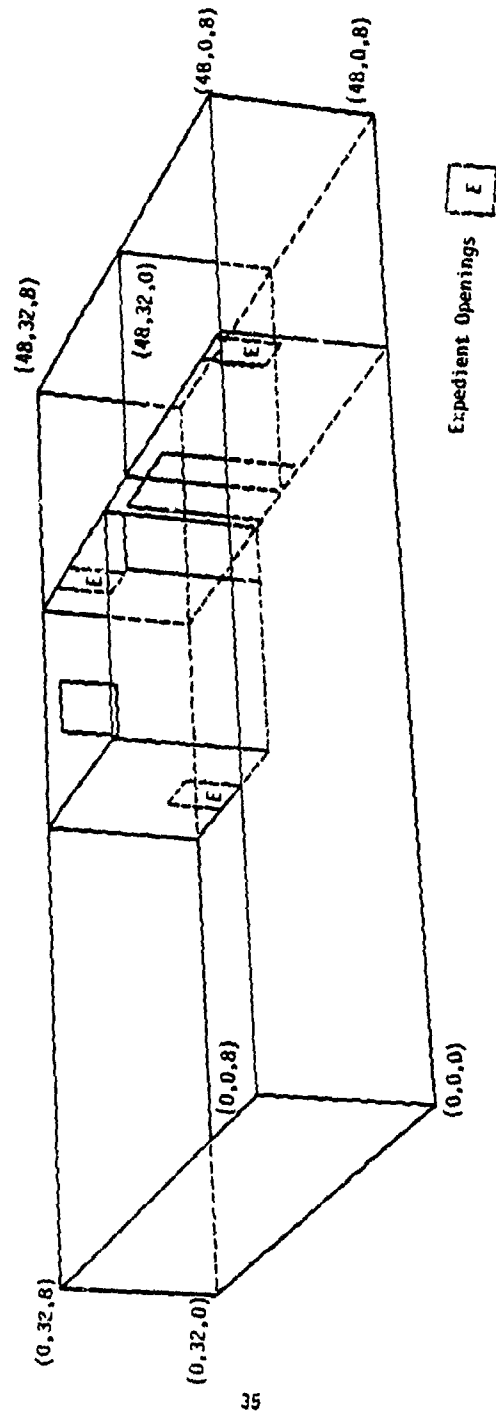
Interior Aperture Locations for Floor Plan 3,
